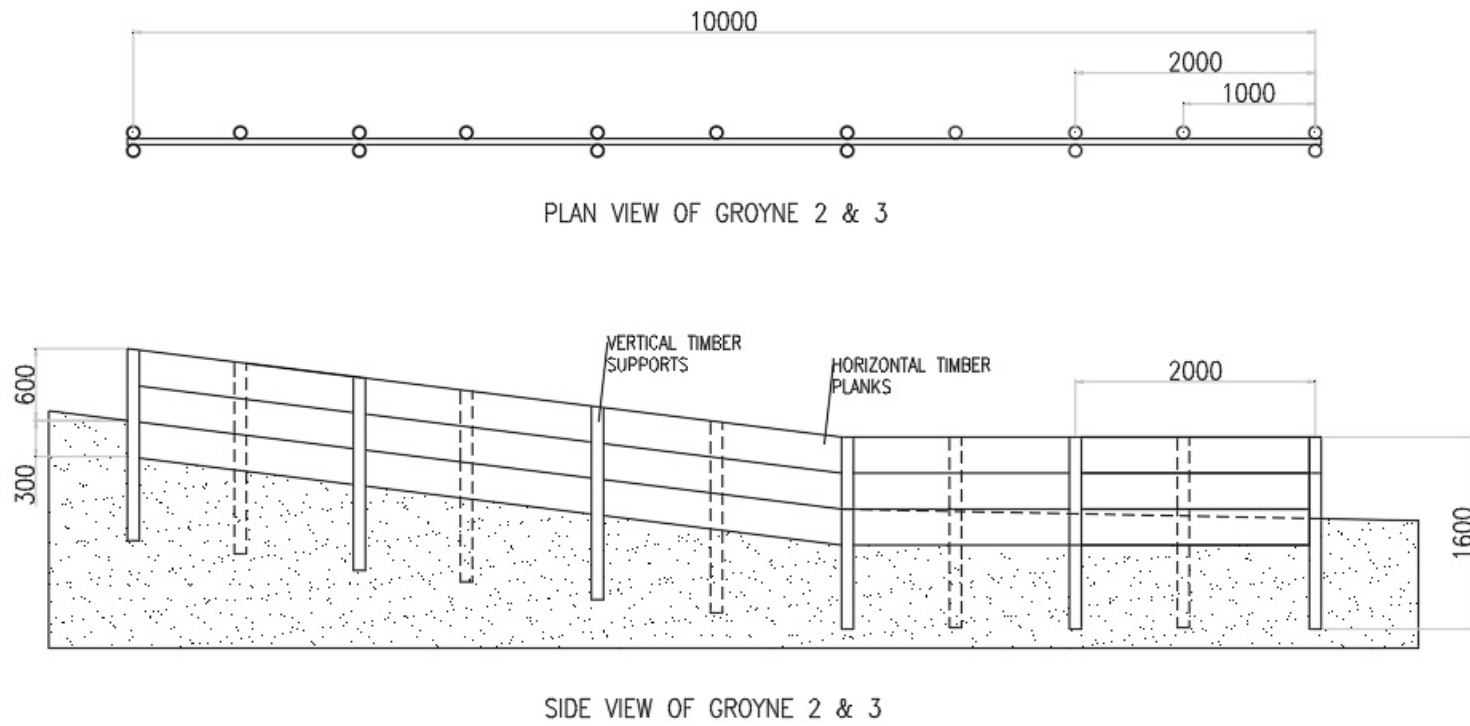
Timber groyne 2 & 3 Detail (Not to scale, all measurements in mm)
